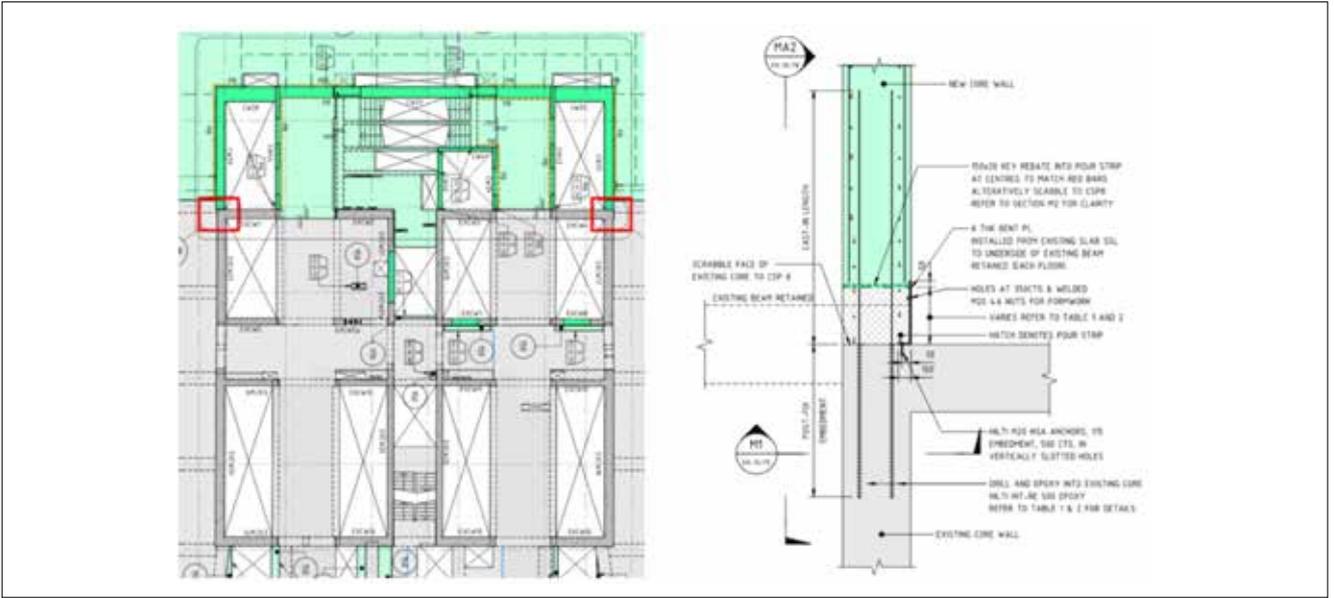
Plan view of existing & new core (left), with the detailed stitch connection (right). The grey is existing and the green is the new construction.
